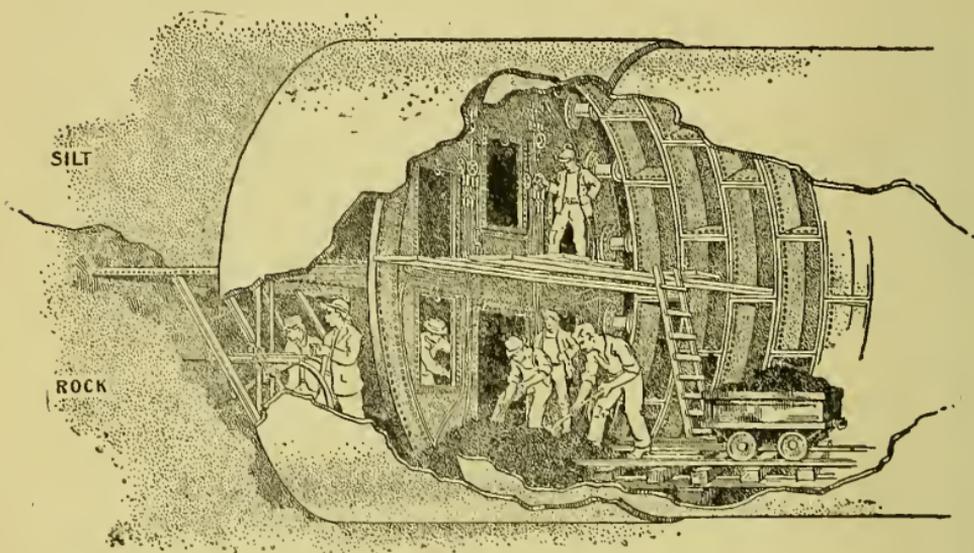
DRILLING THE ROCK LEDGE OUT IN FRONT OF THE SHIELD.
